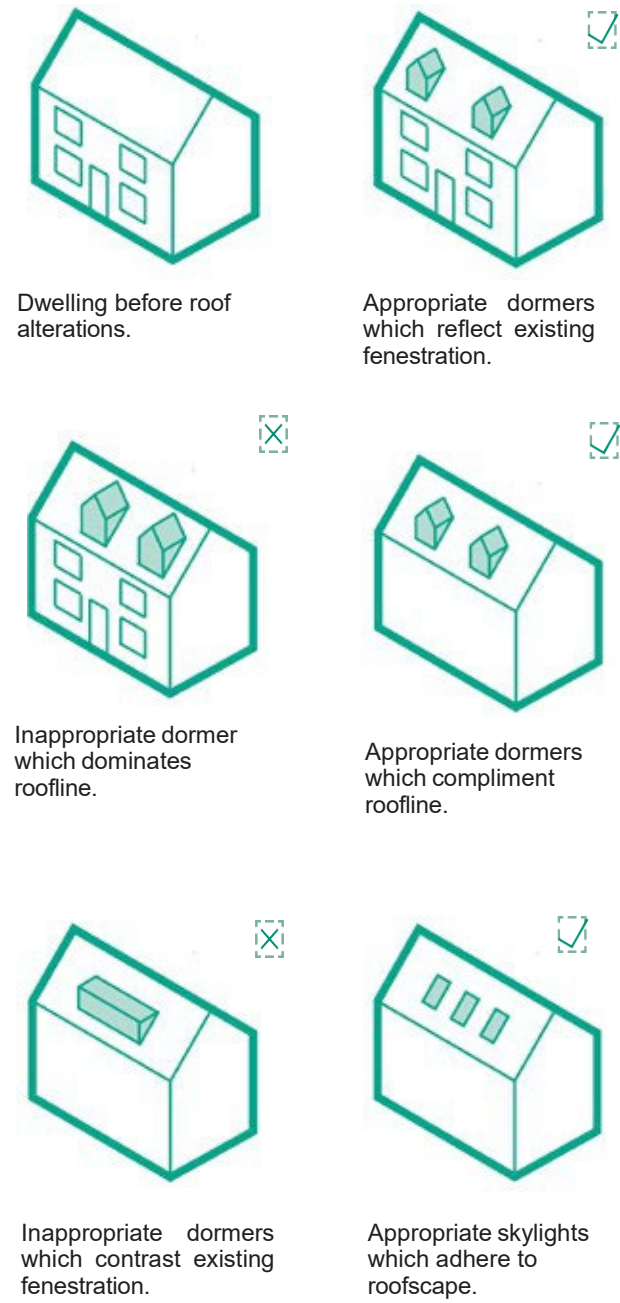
Guidance for dormer window additions on traditional style dwellings.
